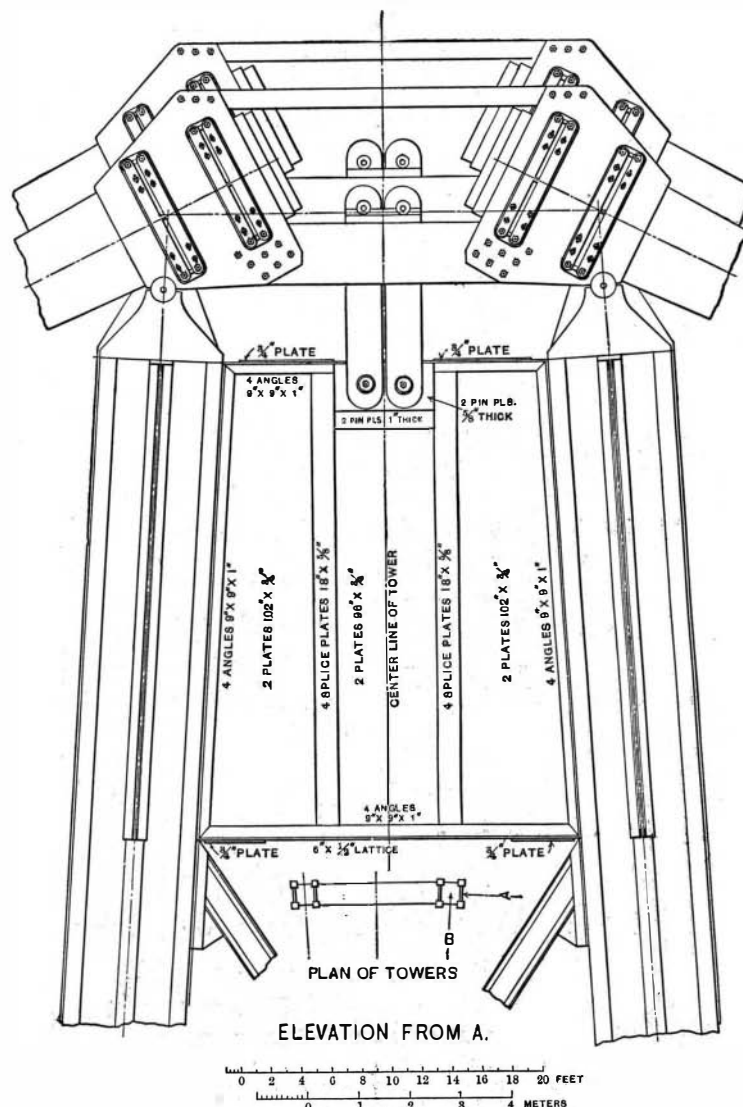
PLATE III.—METHOD OF FASTENING CABLES AND BACKSTAYS AT THE TOP OF TOWERS—3,000 FOOT SUSPENSION BRIDGE.
